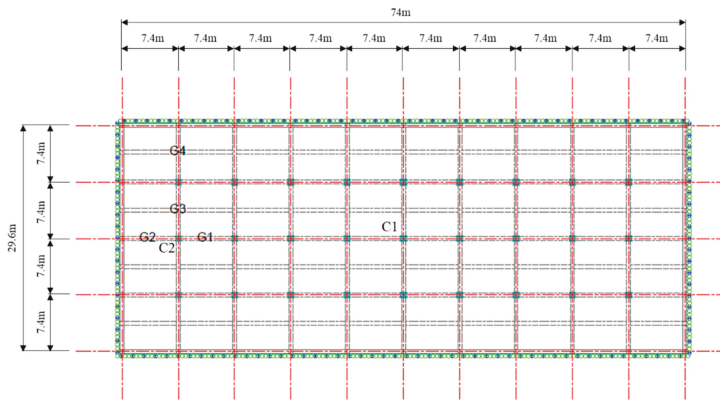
Structural plan of B1 floor in the illustrative examples (unit: mm).
